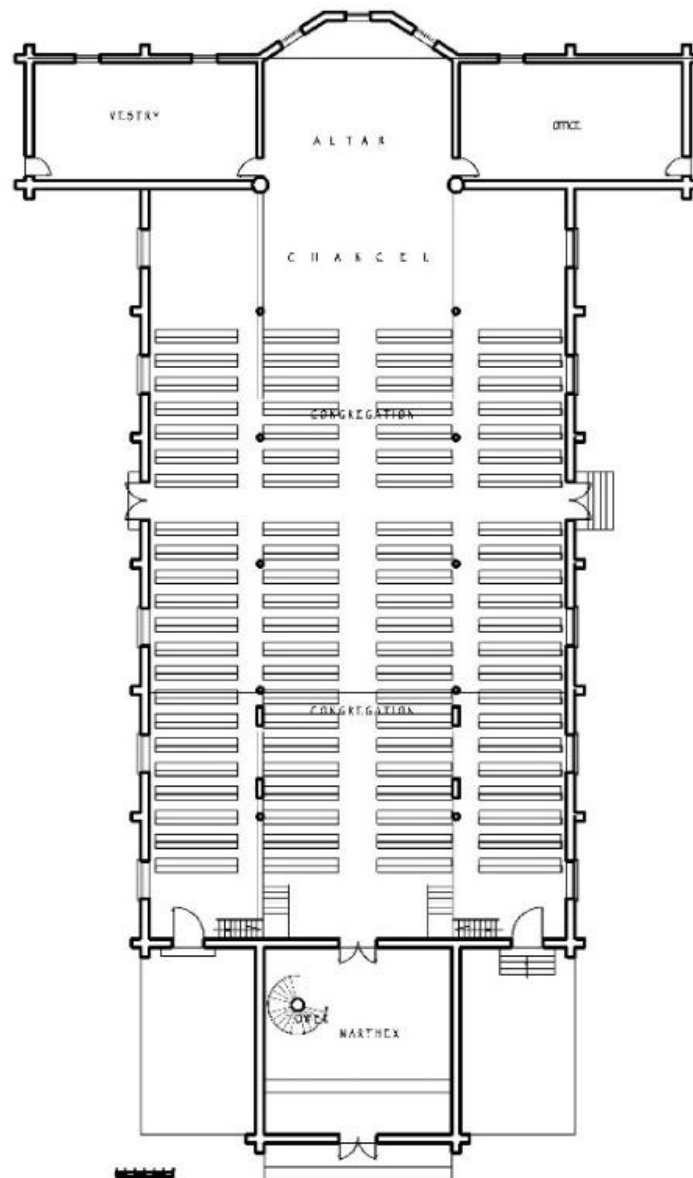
St. David Cathedral Kudeti; ground floor plan.
